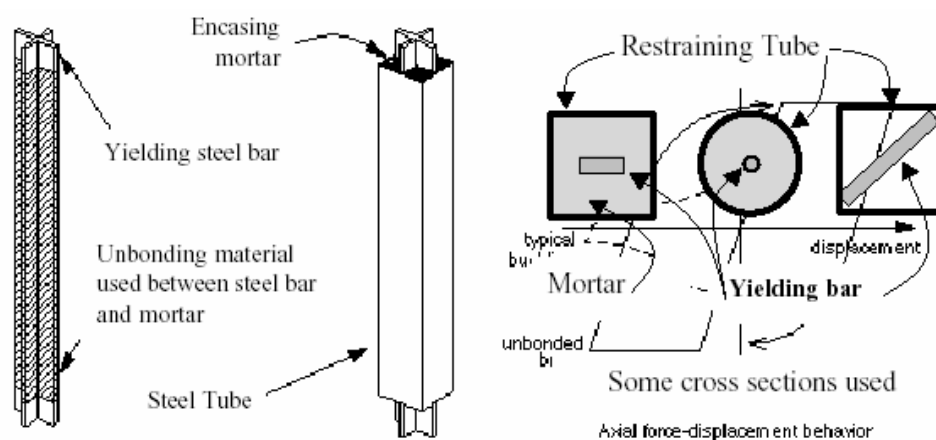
Some schematic details used for buckling restrained braces (Sabelli *et al.* 2003)
